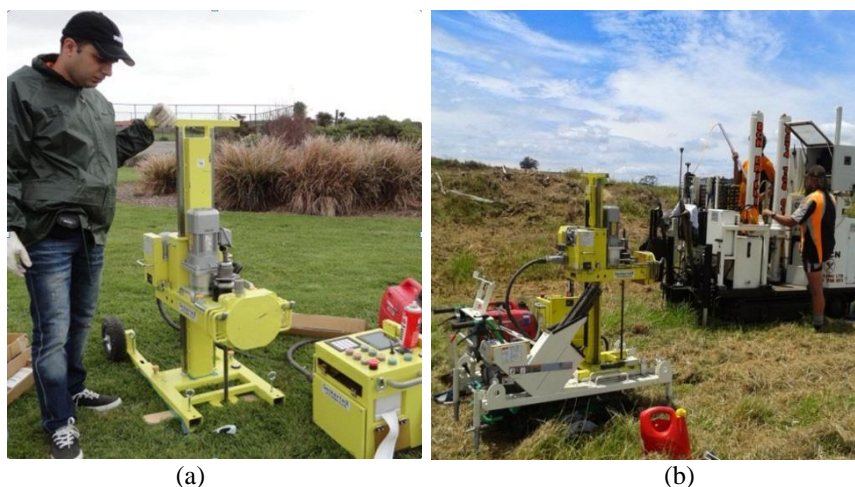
Screw driving sounding (SDS) equipment: (a) SDS machine during operation; (b) SDS machine mounted on a crawler side-by-side with a CPT rig.
